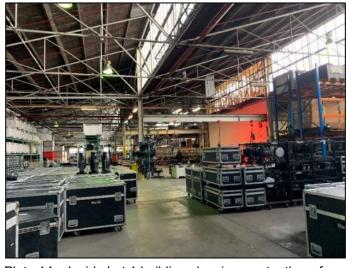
Inside Lot 1 building showing sawtooth roof, concrete floors and storage of lighting equipment.
